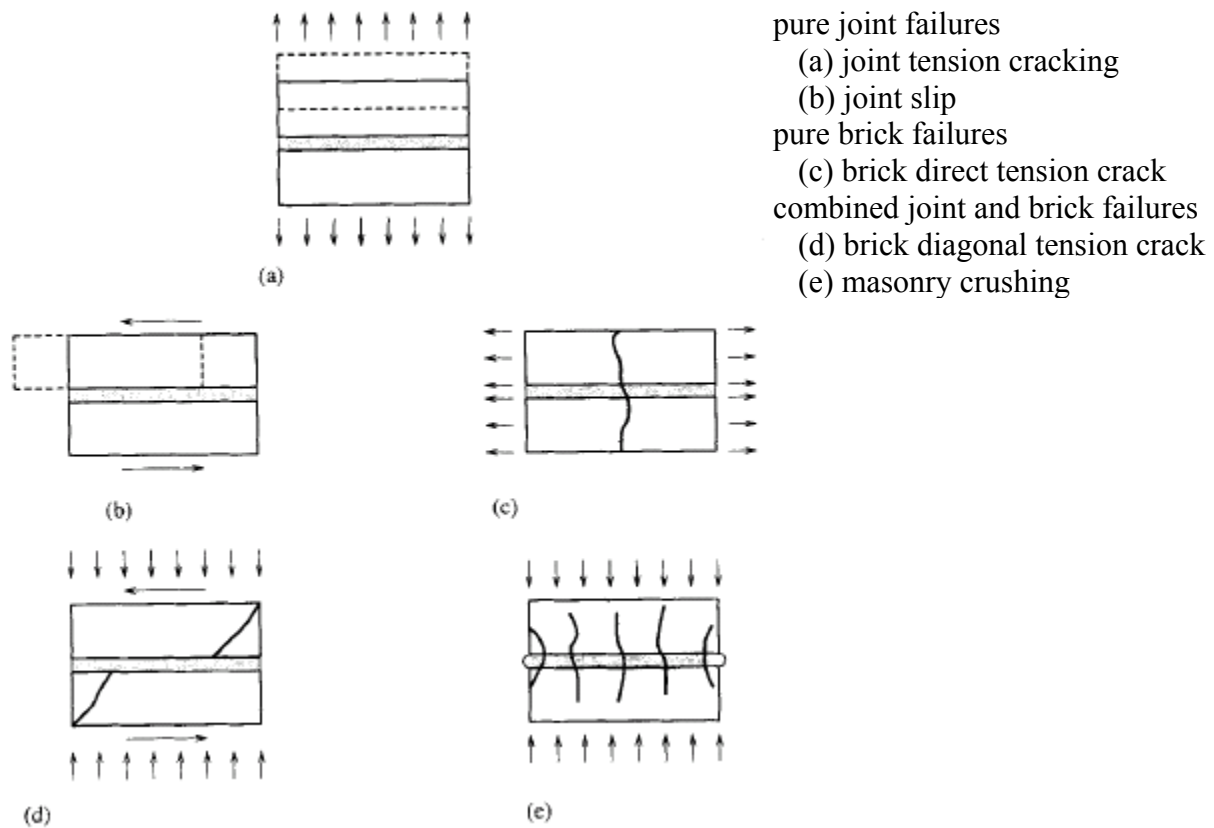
Basic failure mechanisms in masonry subjected to in-plane loads
